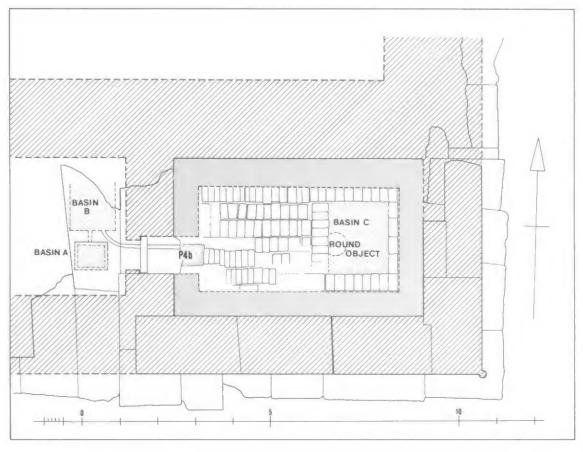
Reconstructed and simplified plan of the brick chamber in the southeast corner of the mortuary temple. Scale 1:100. See pl. 86.
